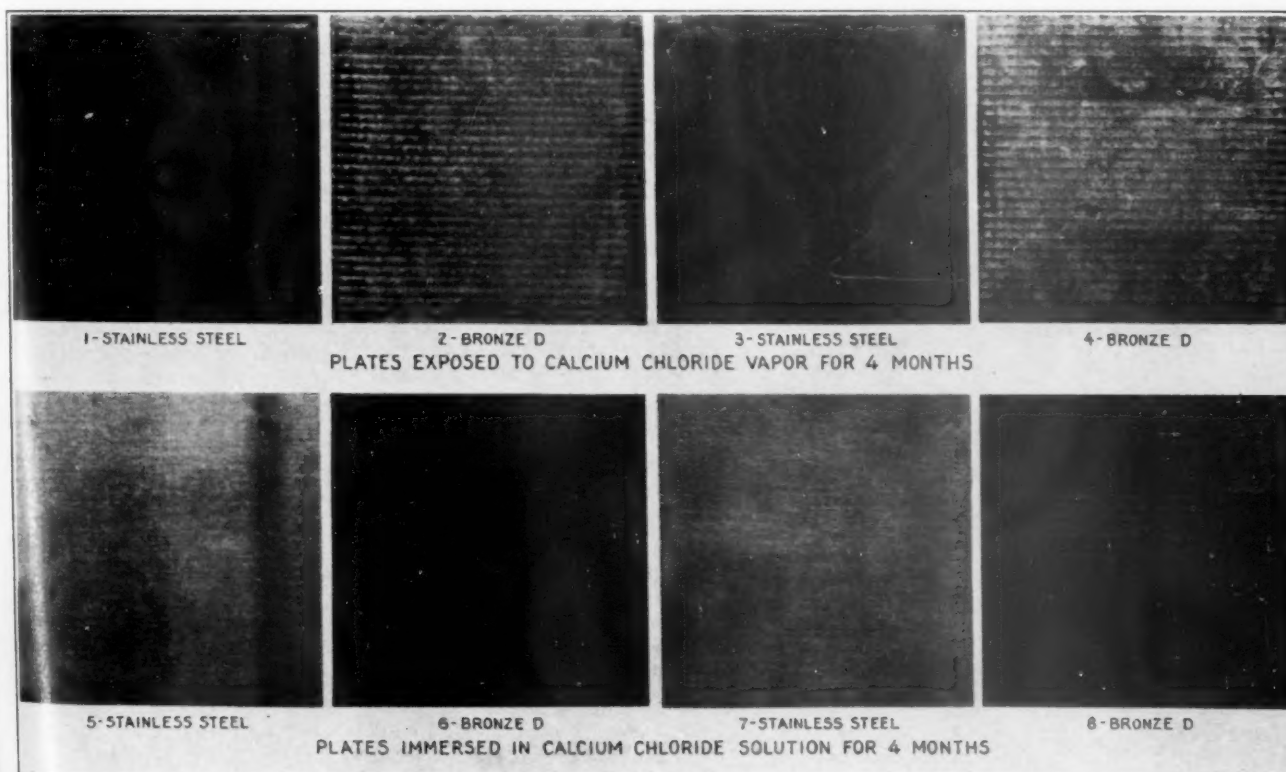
APPEARANCES OF BRONZE AND STAINLESS STEEL BEARING PLATES AFTER IMMERSION IN AND EXPOSURE TO CALCIUM CHLORIDE. STRIPS OF WOOD INSULATED THE IRON CLAMPS FROM THE PLATES. NOS. 1, 2, 5, AND 6 WERE CONTACT FACES, AND NOS. 3, 4, 7, AND 8 WERE OUTER FACES OF PLATES.
